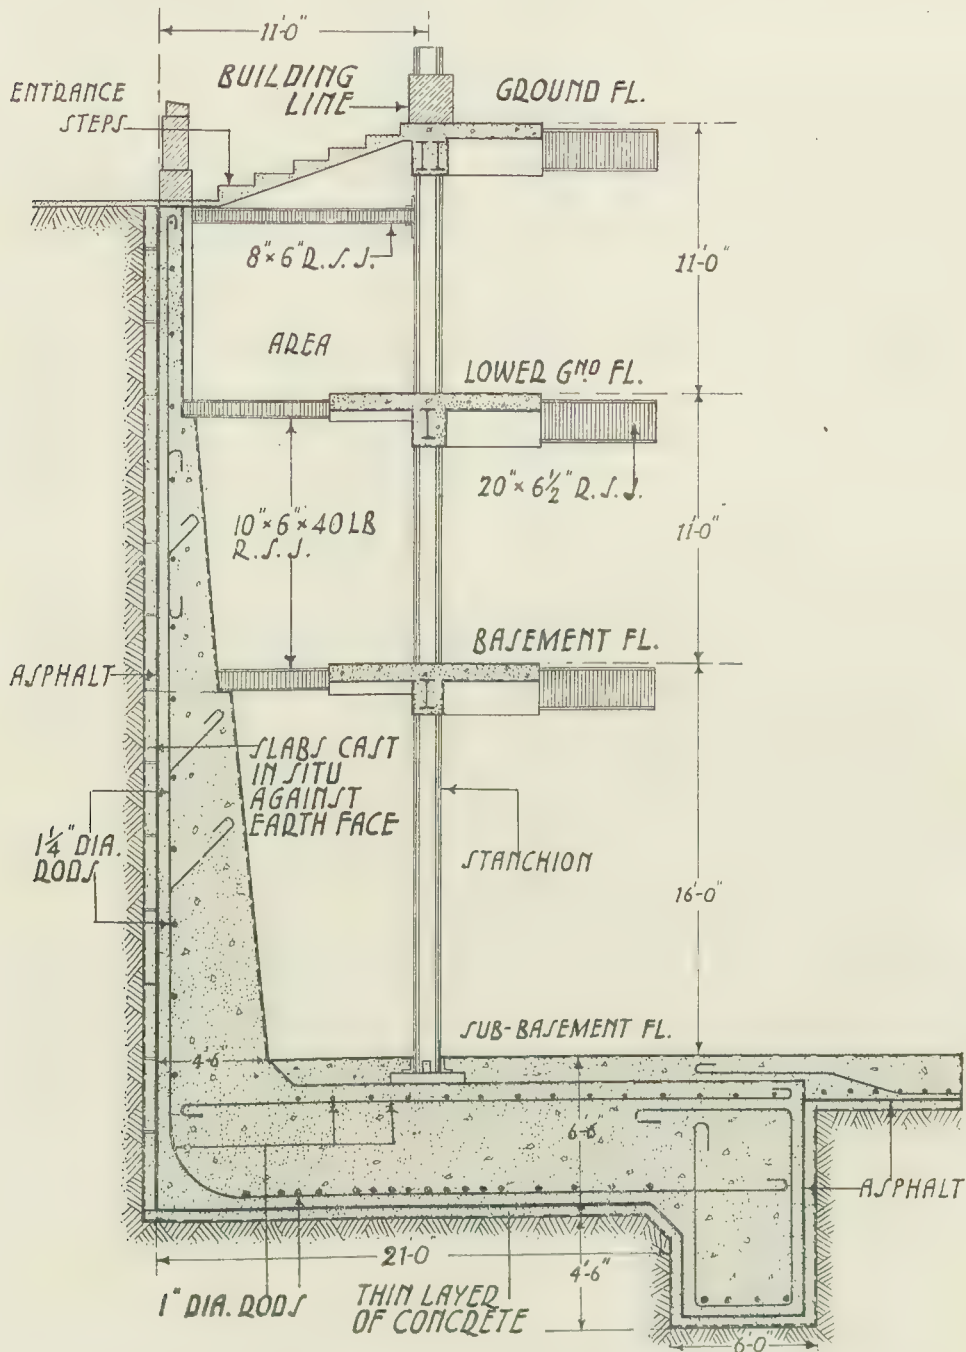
REINFORCED CONCRETE RETAINING WALL FOR MULTIPLE BASEMENT FLOORS
